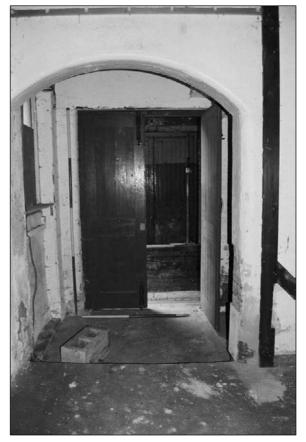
View of archway with loading door beyond leading to cart passage, room G2, west range (film 22.35)
